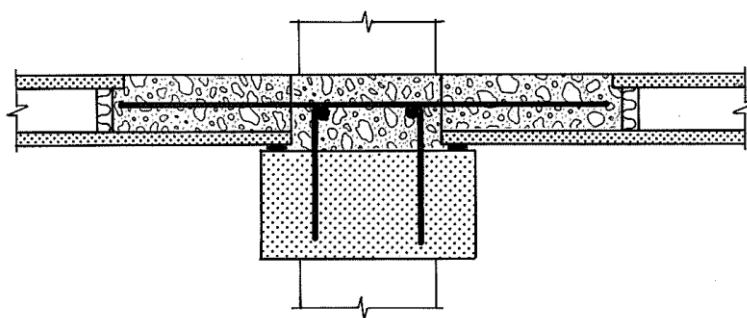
Connection for prefabricated concrete elements, connecting two floor elements upon a beam, from FIP (1988).
